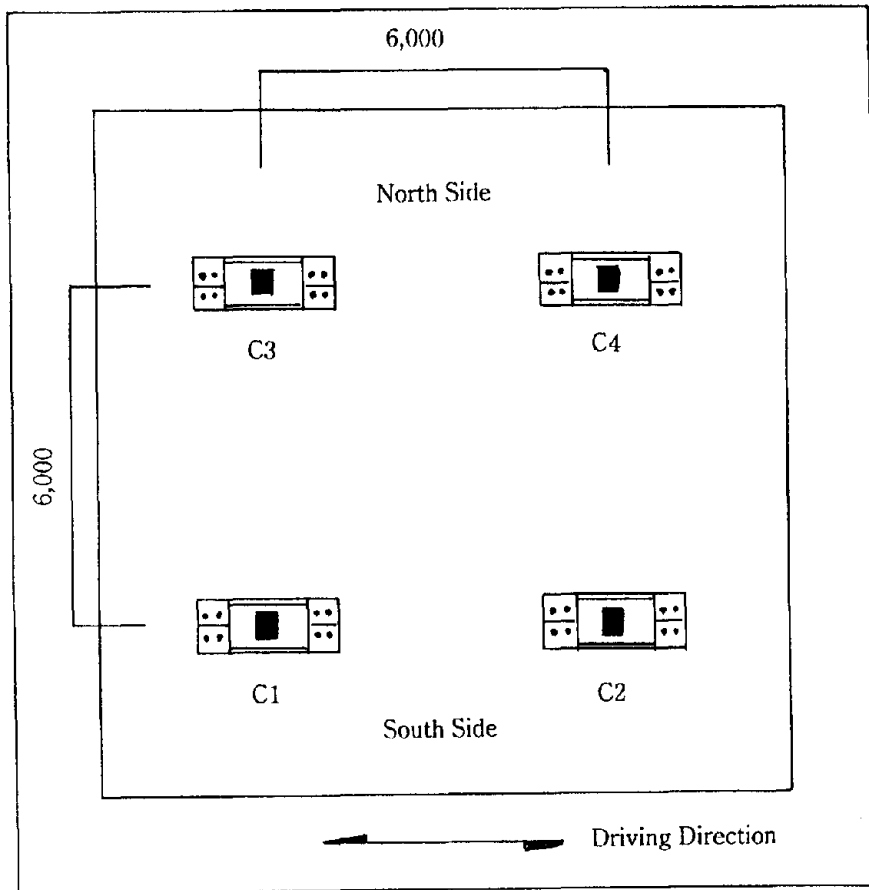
Plan of 1-Story Test Specimen on Shaking Table
